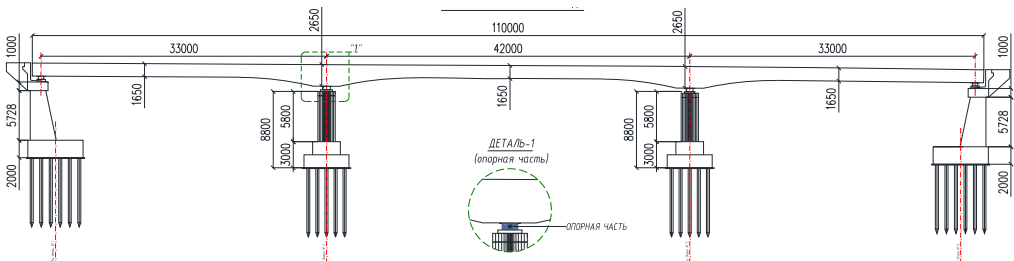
Overview of the continuous (monolithic) reinforced concrete overpass in Samarkand
